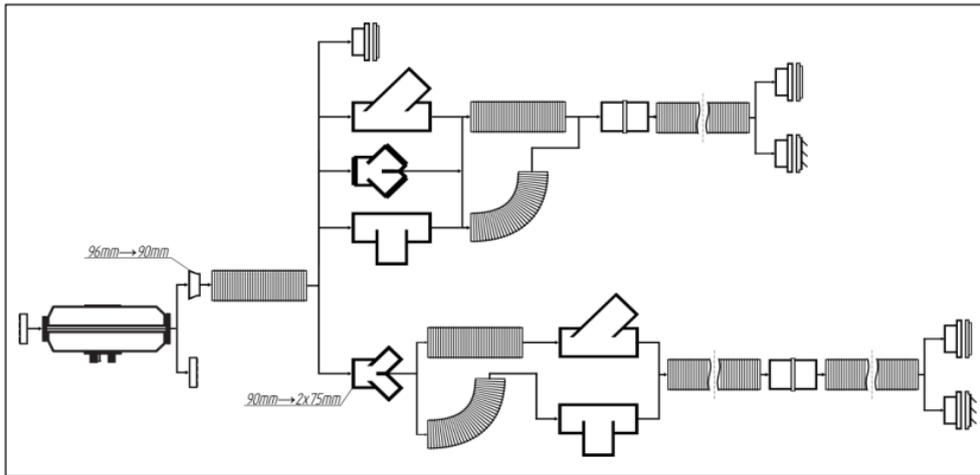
Air duct connections for AIR-4D (90mm/75mm)
